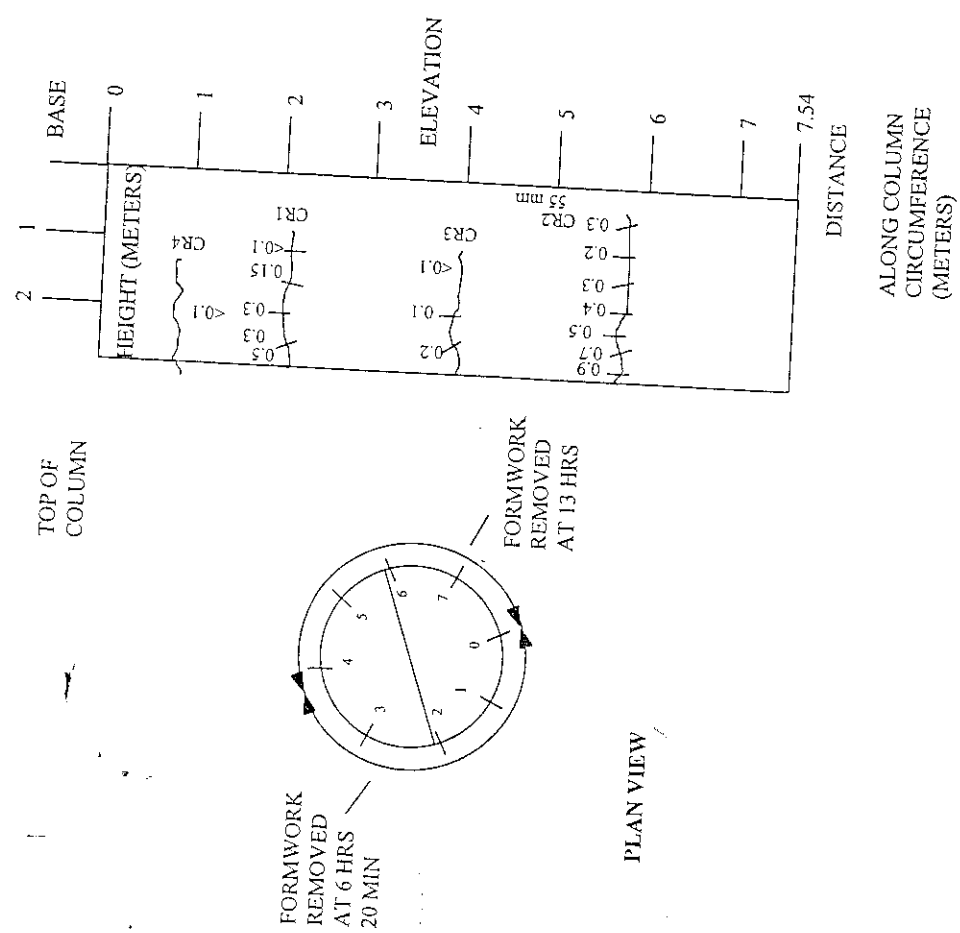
Visual survey of column 1 cracks (23 hrs after casting)
